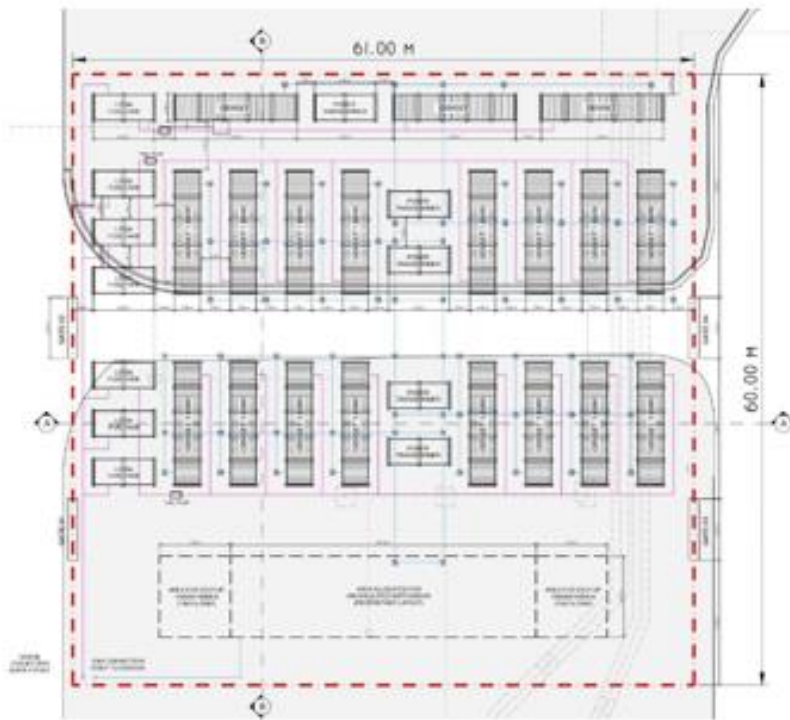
Indicative general arrangement layout of the proposal on Site 1 (Source: PDS)
